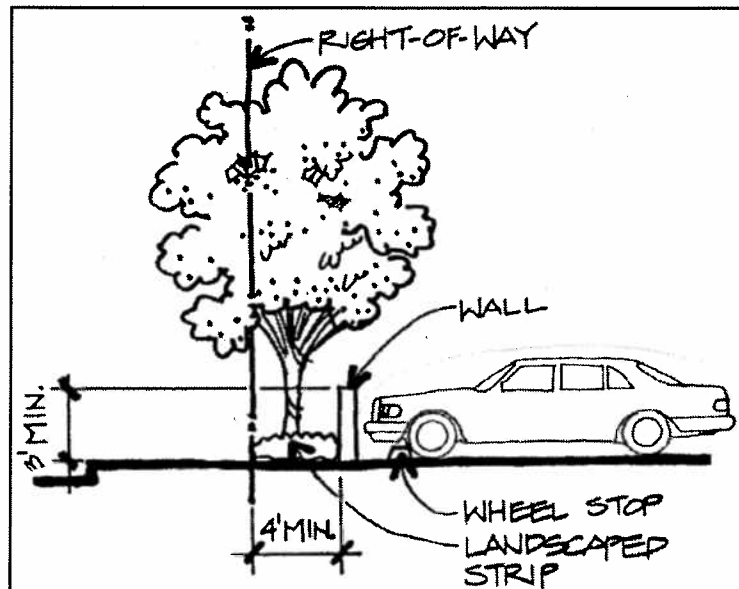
Parking Lot Landscaped Strip, Option 4
